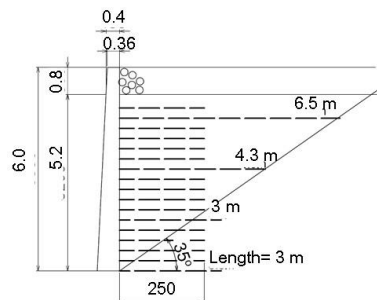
Typical GRS retaining wall with a staged-constructed FHR facing.
